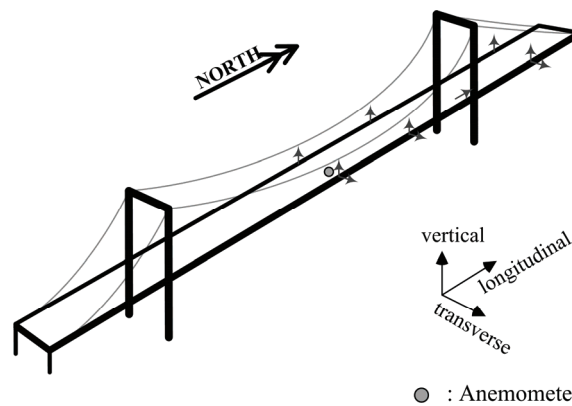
Location of sensors installed on the New Carquinez Bridge (from (Ubertini et al., submitted))
